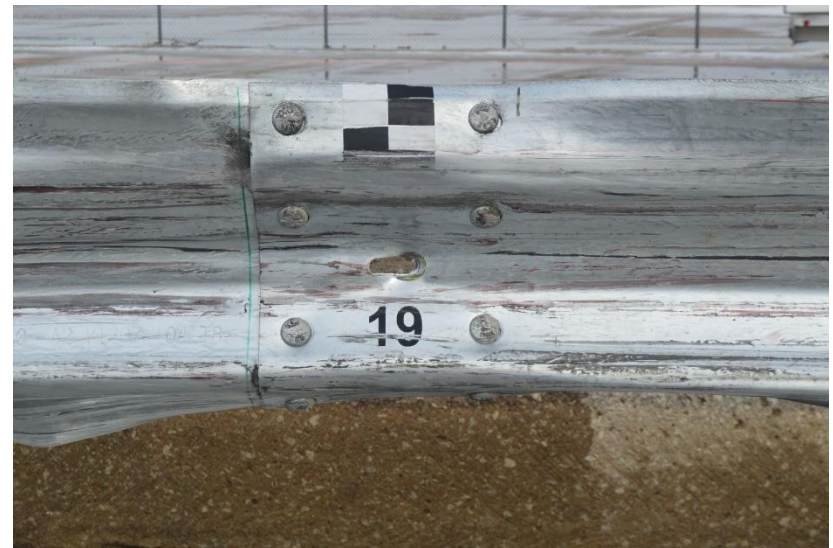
Guardrail Damage, Post Nos. 15 through 19, Test No. CMGS-2
